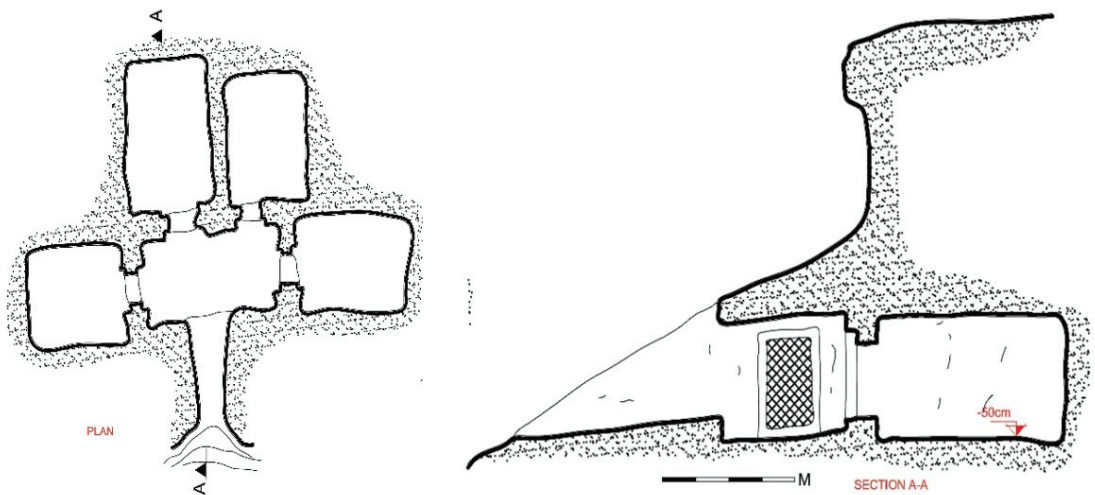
The fourth-stage fulfillment of excavation of rooms in cross-section and plan view.
